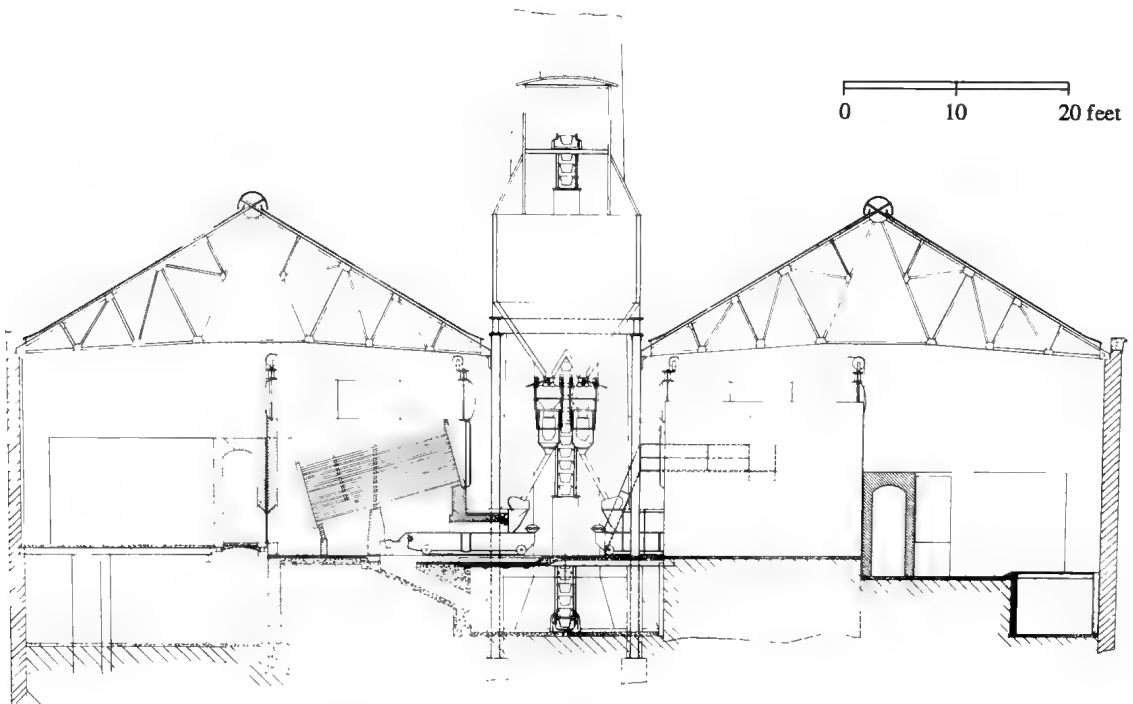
City Electric Light Co. Ltd William St power station. The boiler house was rearranged in 1913 to accommodate water-tube boilers in place of the fire-tube boilers originally installed. The greater headroom needed required the boiler house roof to be raised by seven ft. In addition new flues, coal bunkers, conveyors and, later, extra chimneys were provided.
